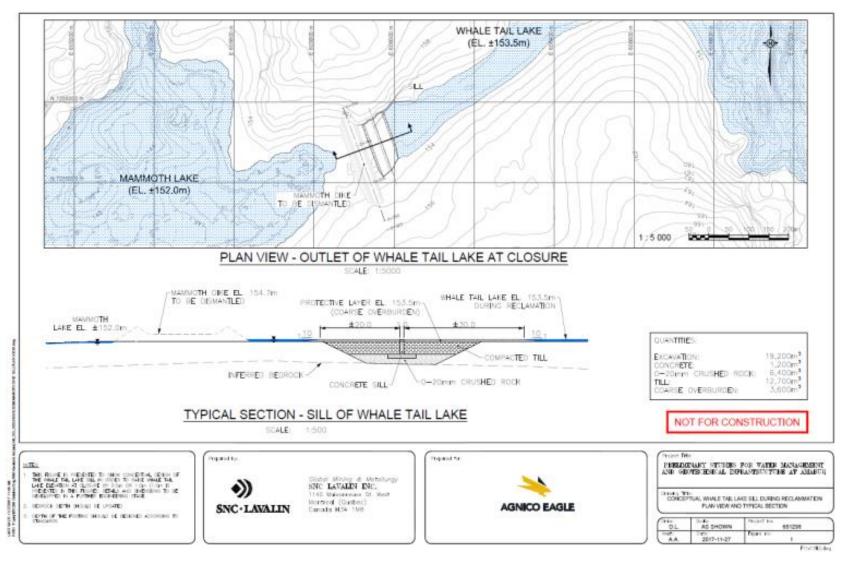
Preliminary Engineering Design for Sill to Raise Water Level of Whale Tail Lake under the Approved Whale Tail Pit Project (a similar design is proposed for the sill between A18 and Whale Tail Lake for the Whale Tail Pit Expansion Project)
